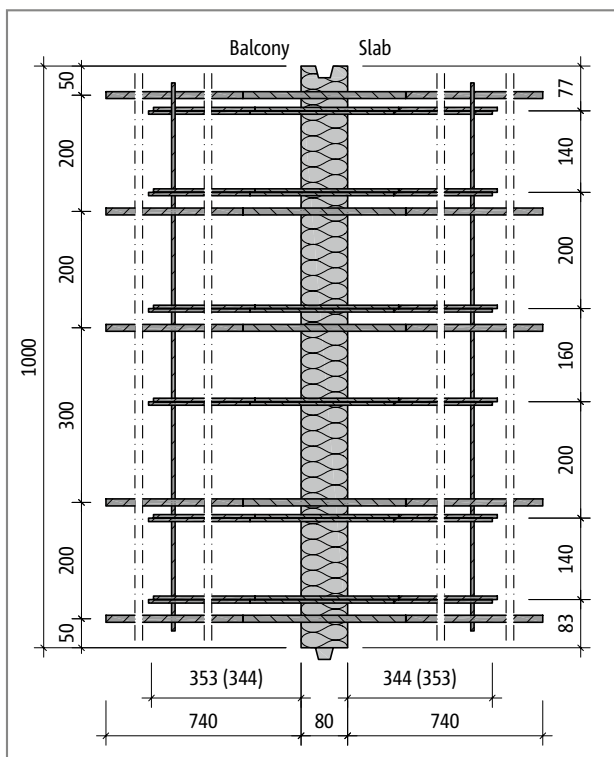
Schöck Isokorb® T type D-MM2-VV1: Layout
